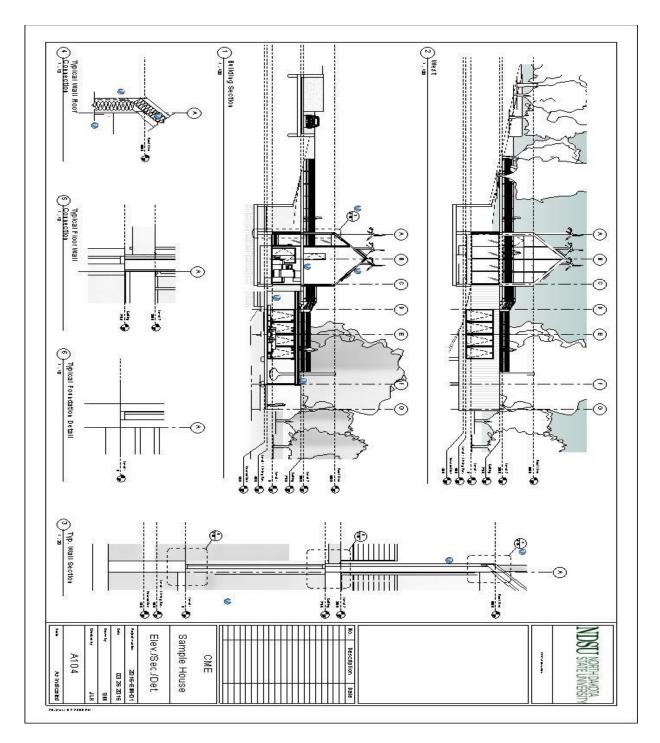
Sample BIM: Elevations, Sections & Details [Landscape]
